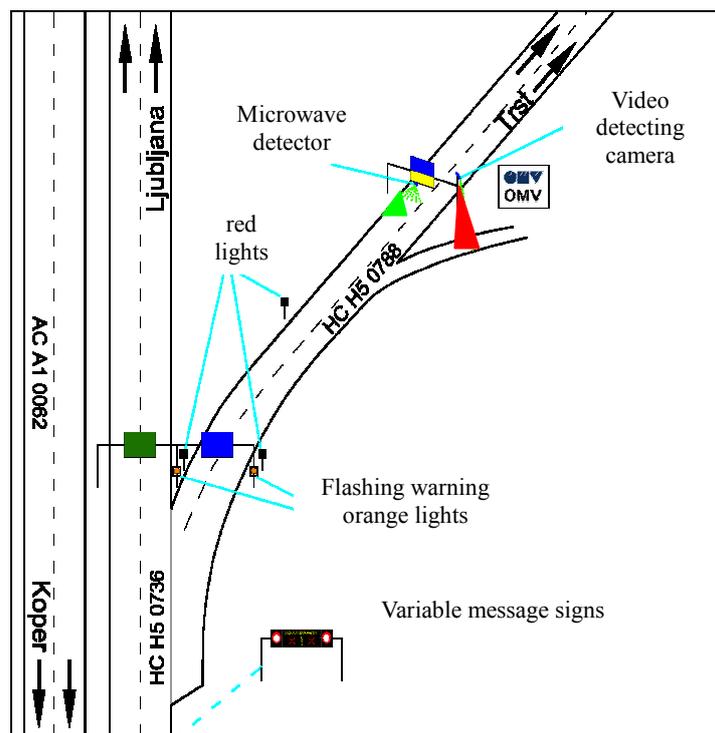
Layout of the wrong way detection system in the area of exit ramp H5 for Trieste
